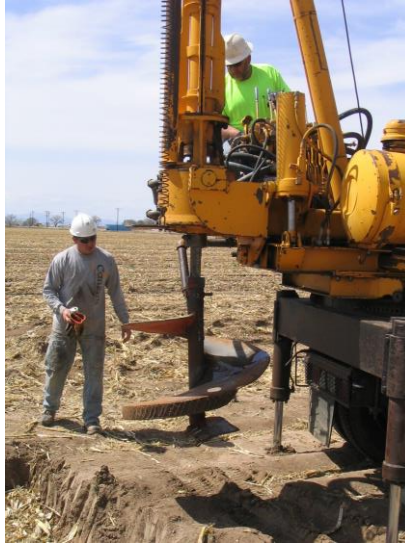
Photograph of auger bit used to drill holes for lysimeters.
